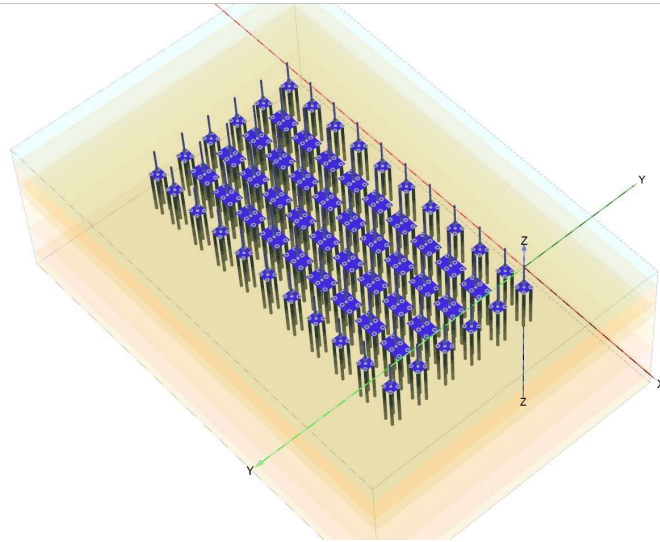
The single pile reinforcement for the exterior pile group.
